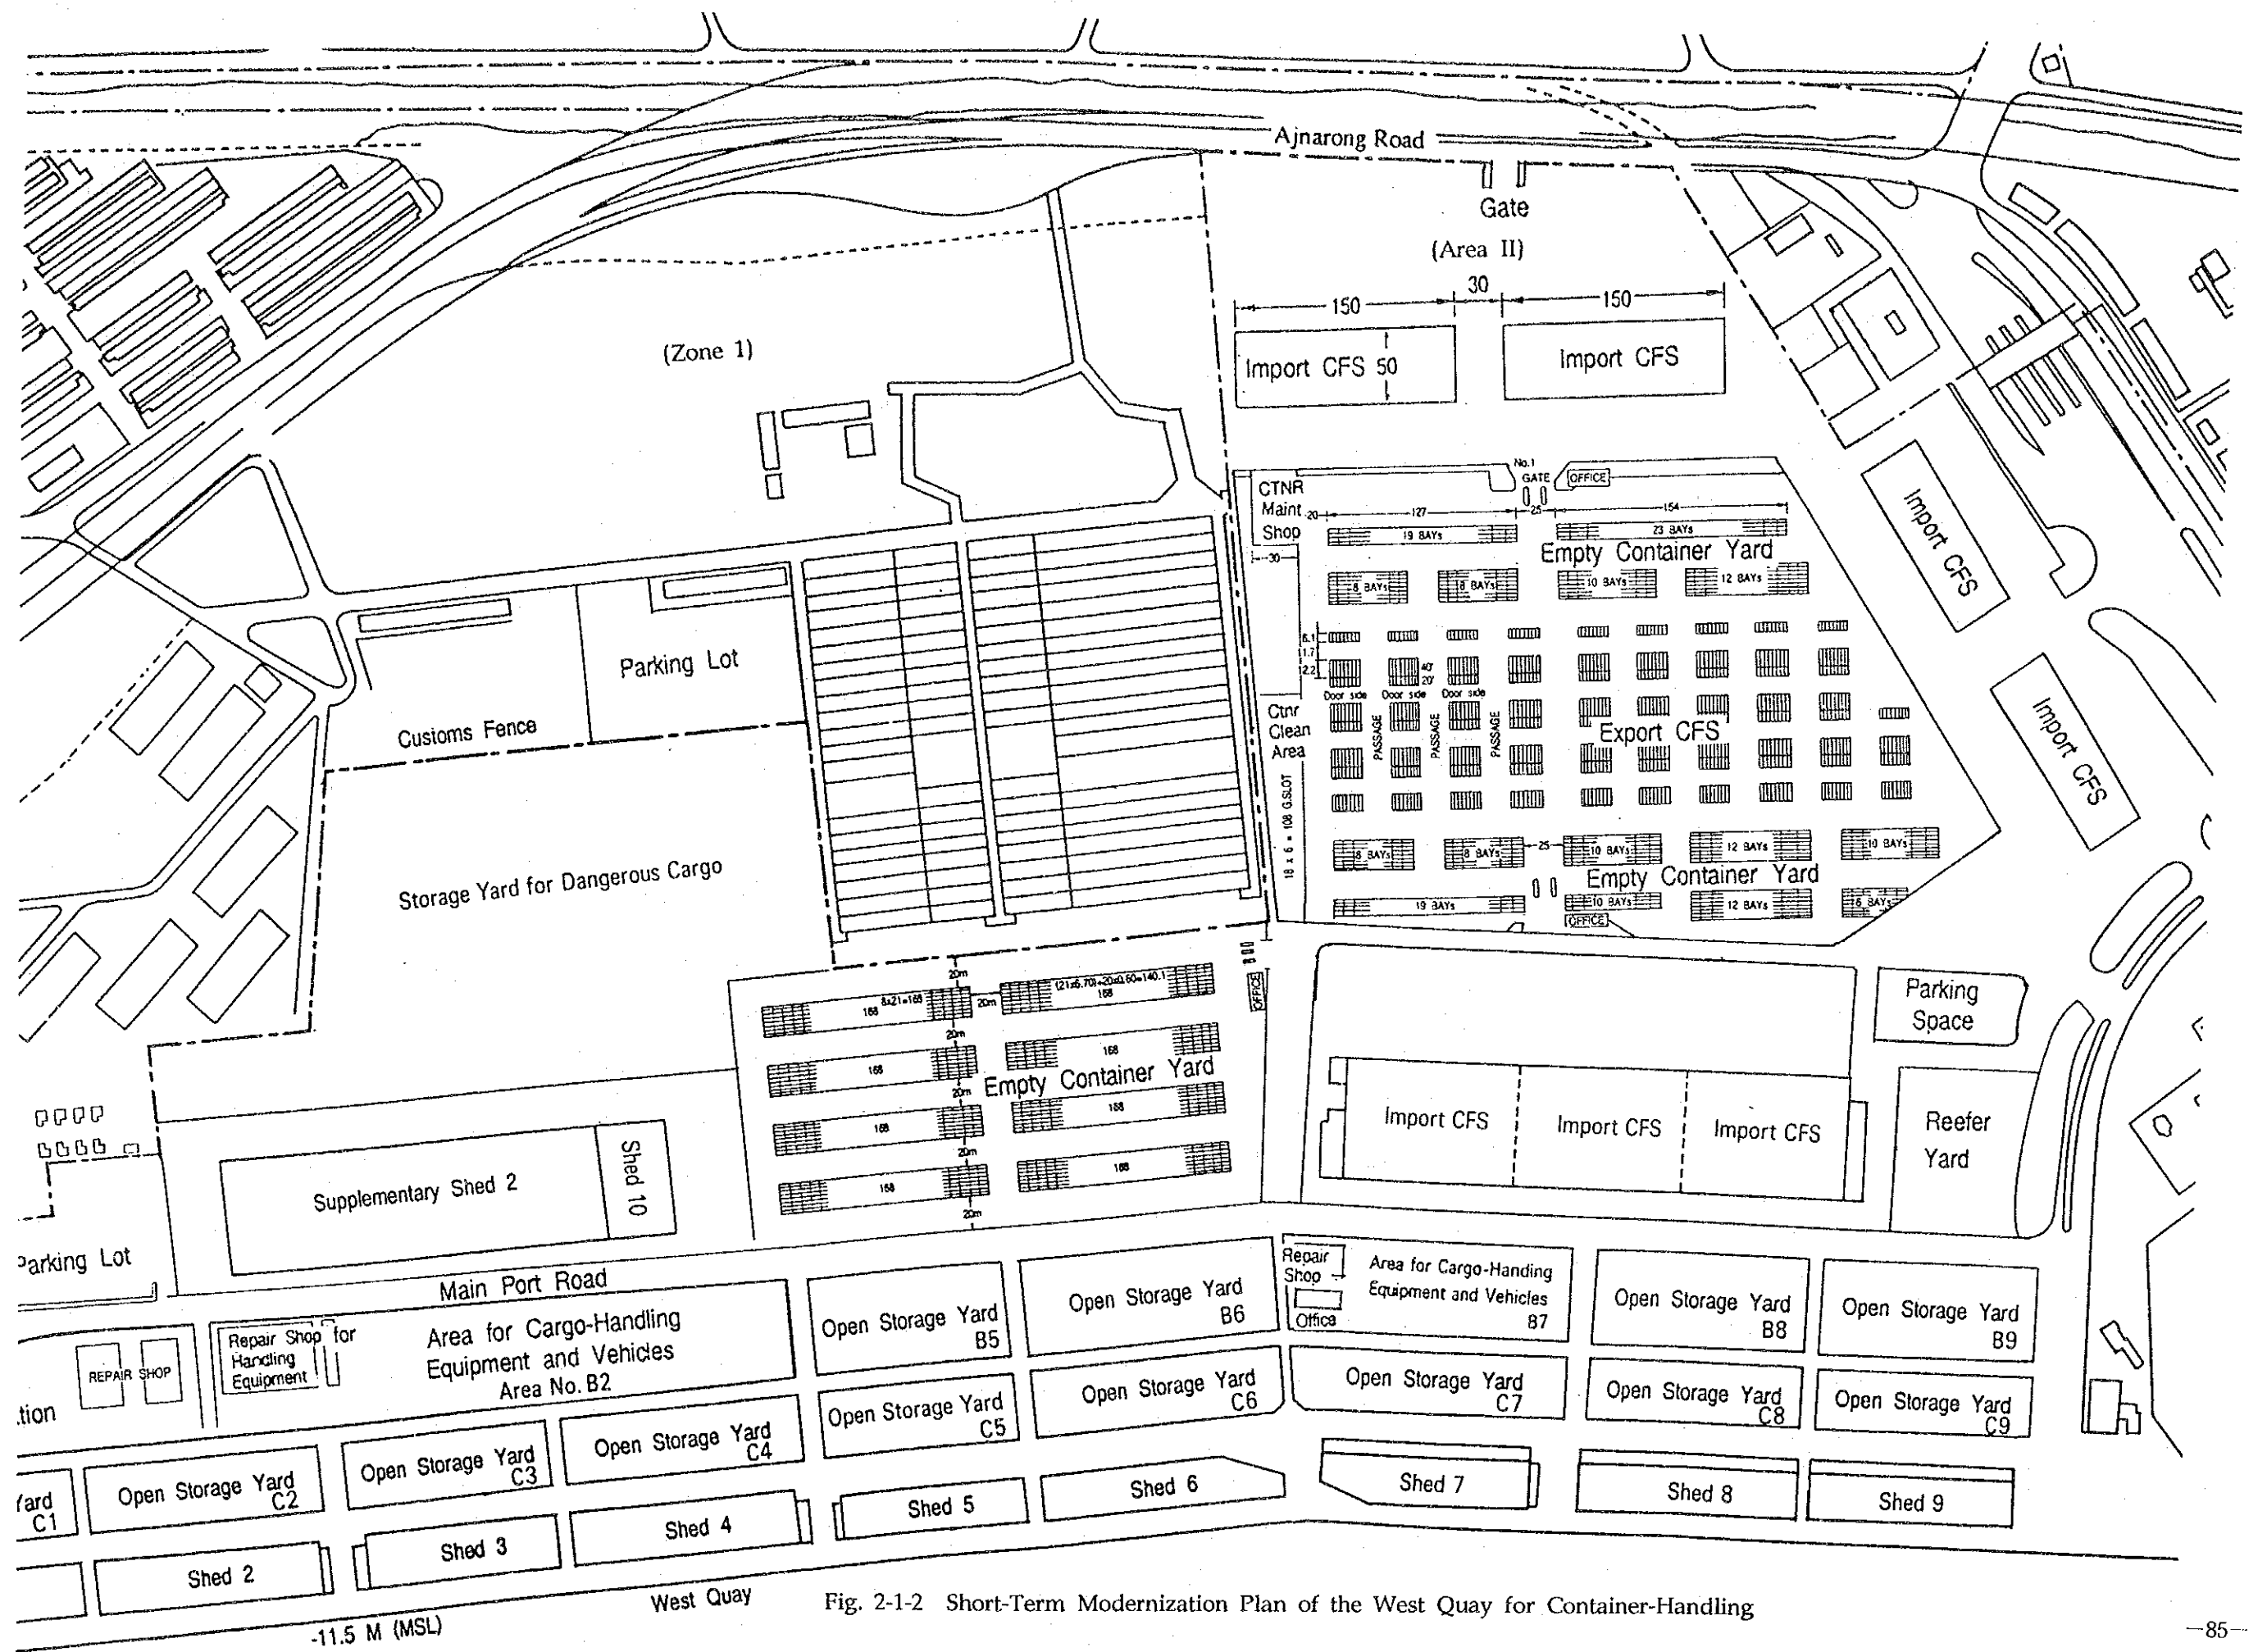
Short-Term Modernization Plan of the West Quay for Container-Handling
